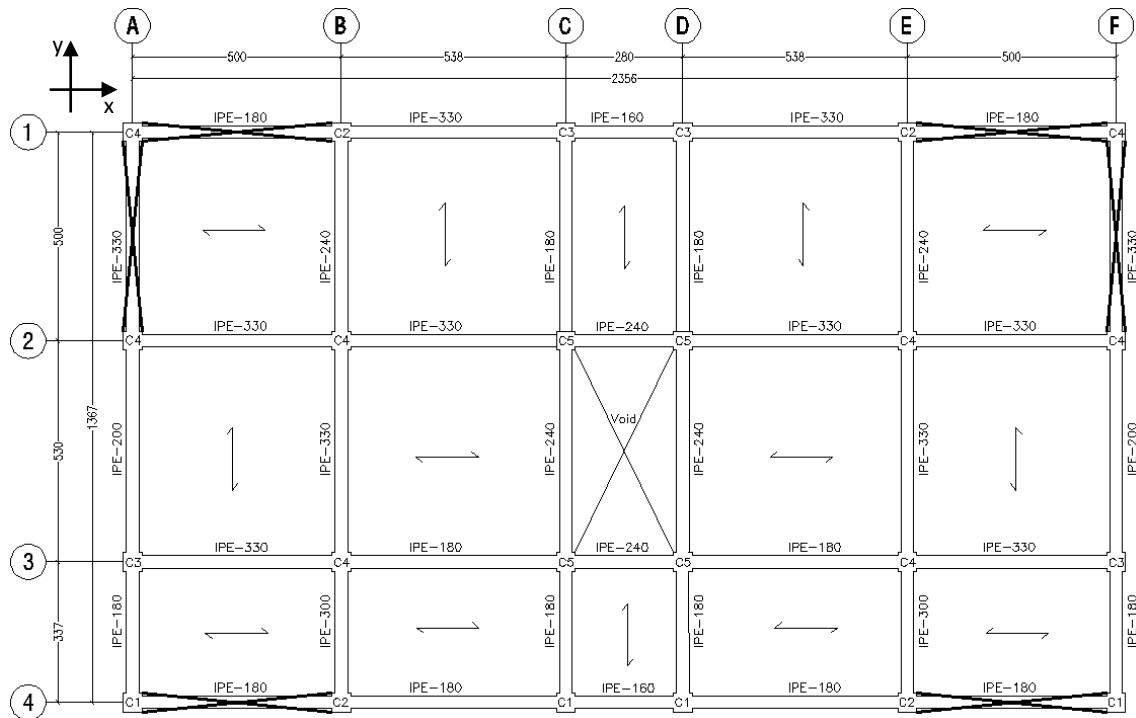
Plan of the 1st floor of index building (units in centimetre)
